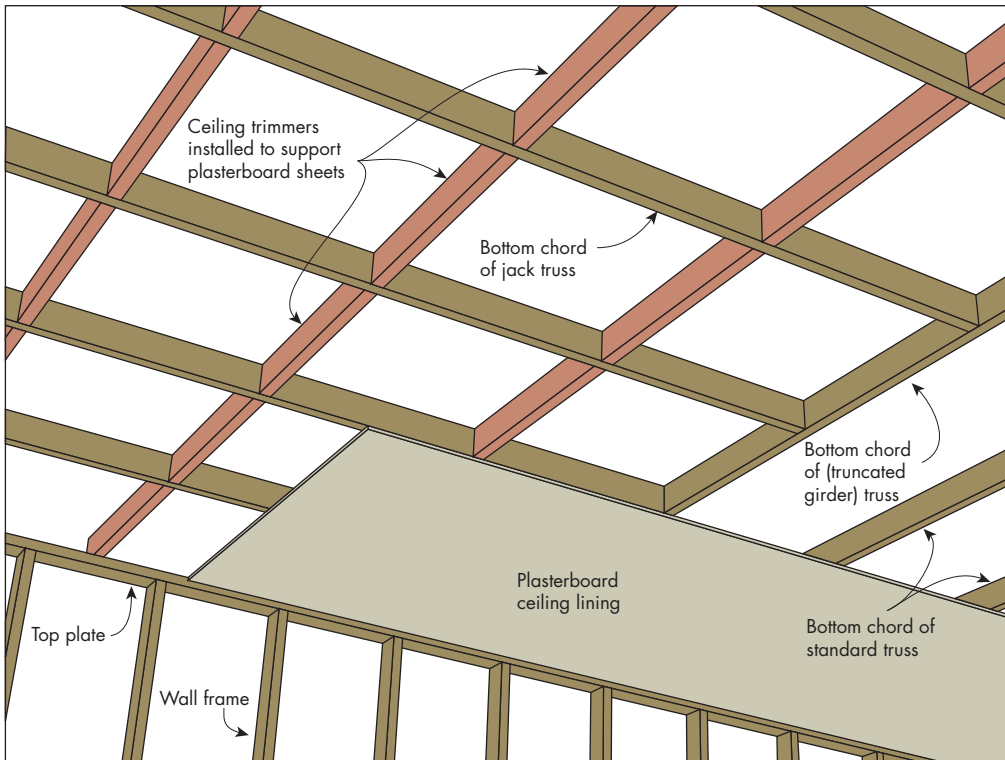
Install Ceiling Trimmers to Support Plasterboard at The Change of Direction of Roof Framing. Install Plasterboard Perpendicular To Main Roof Frame
